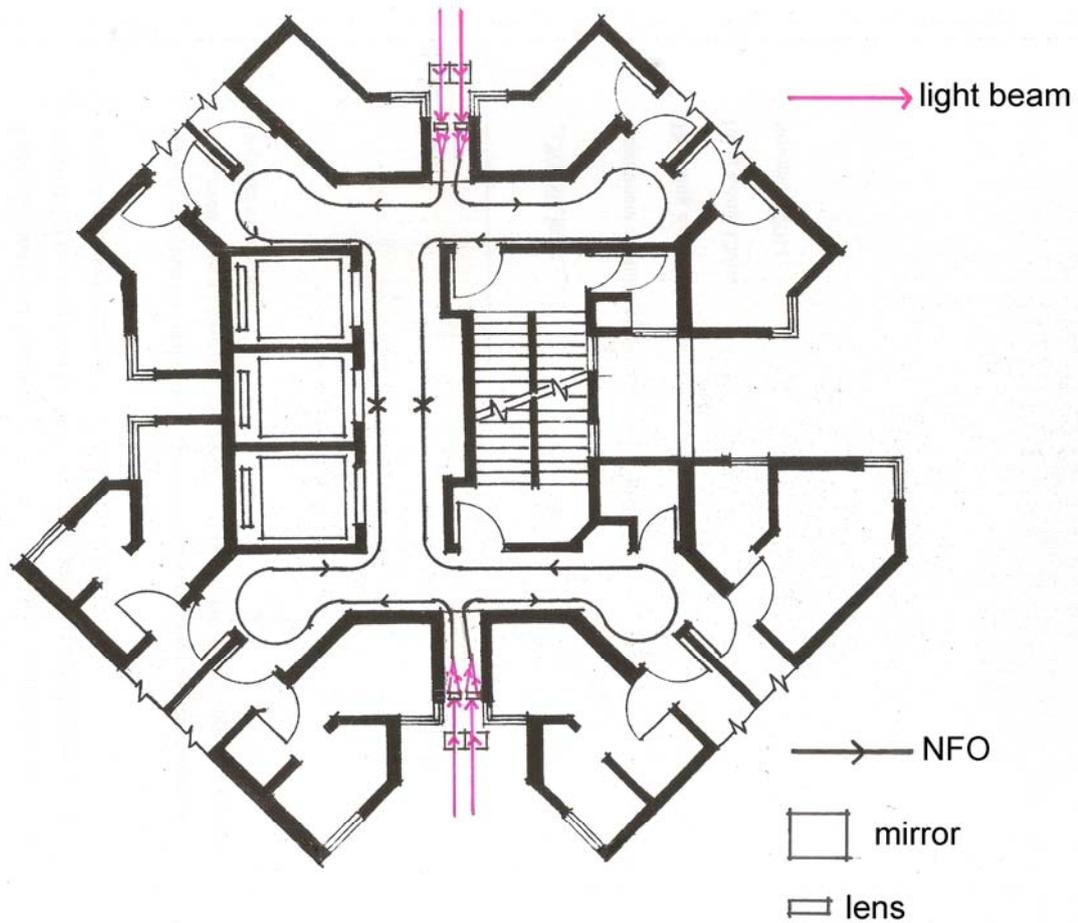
The proposed layout of the RSSL in the lift lobby
